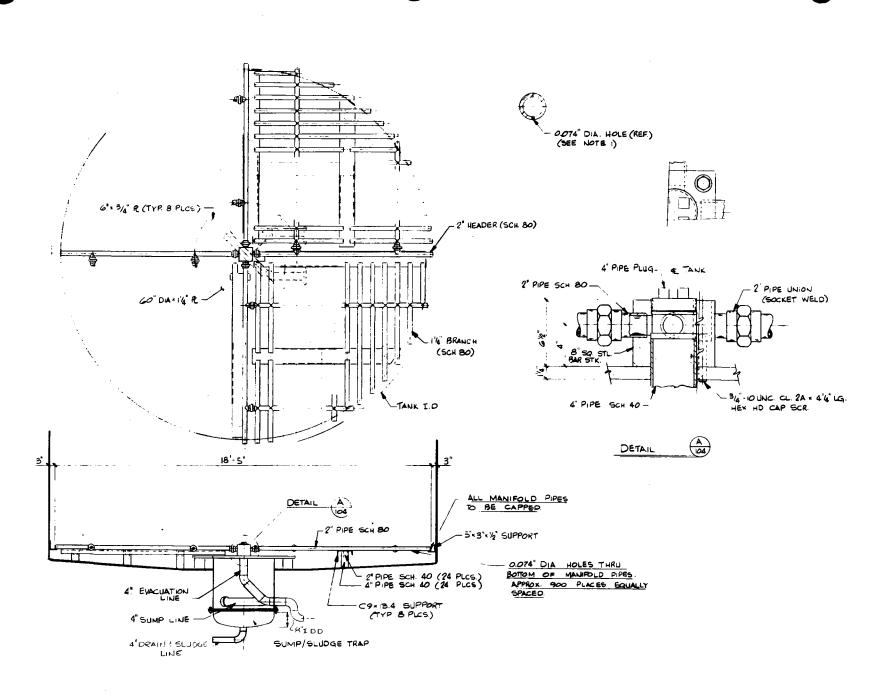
Tank Outlet Piping Arrangement
